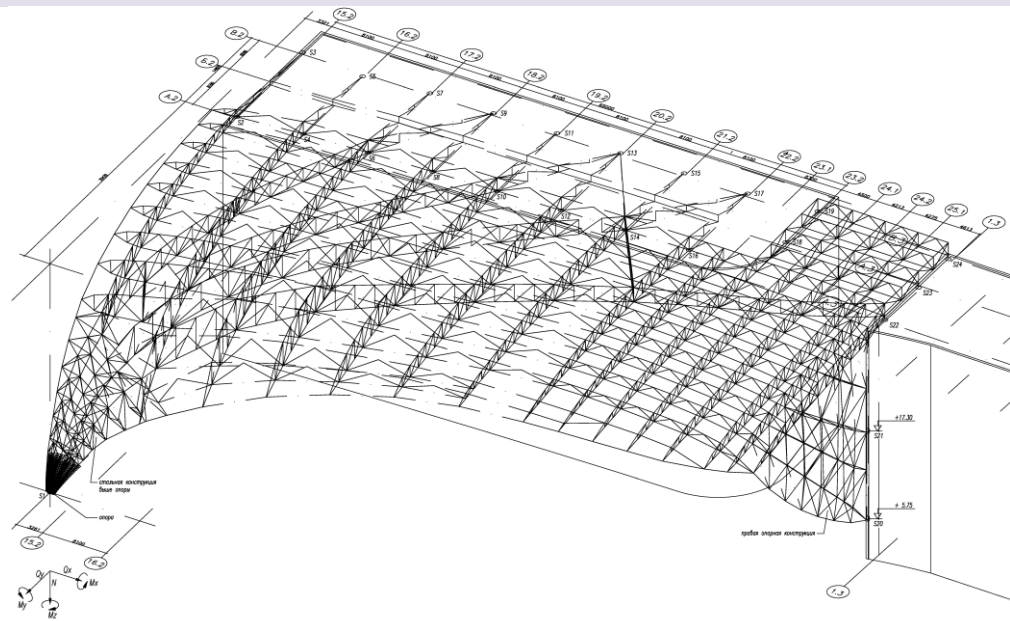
Construction of the northern canopy (main trusses, diagonal trusses and secondary trusses)
